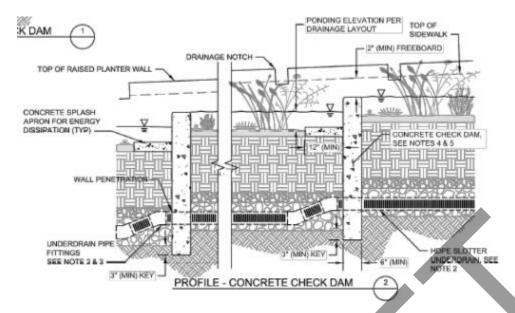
Design details showing the profile and concrete check dam at the Santa Clara Street bioretention facility, Brisbane, CA.
